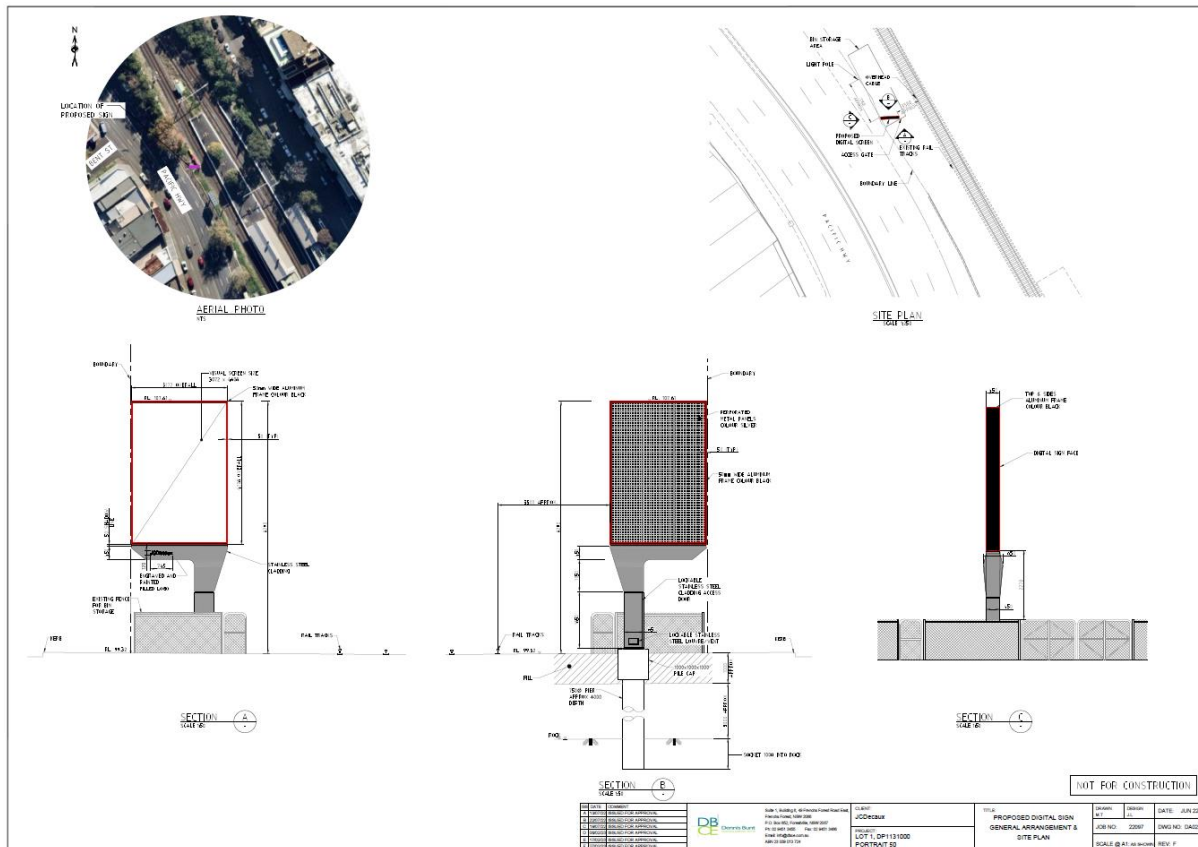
| Proposed Site Plan and Elevation of proposed signage (Source: Applicant's documentation)
